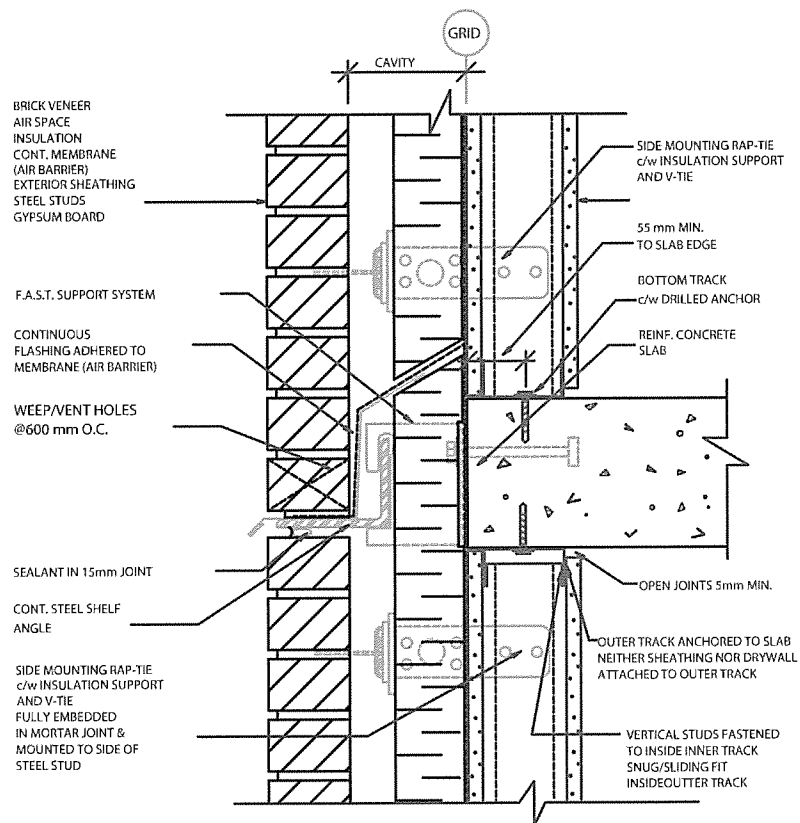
BRICK VENEER/STEEL STUD - DETAIL AT SLAB EDGE
